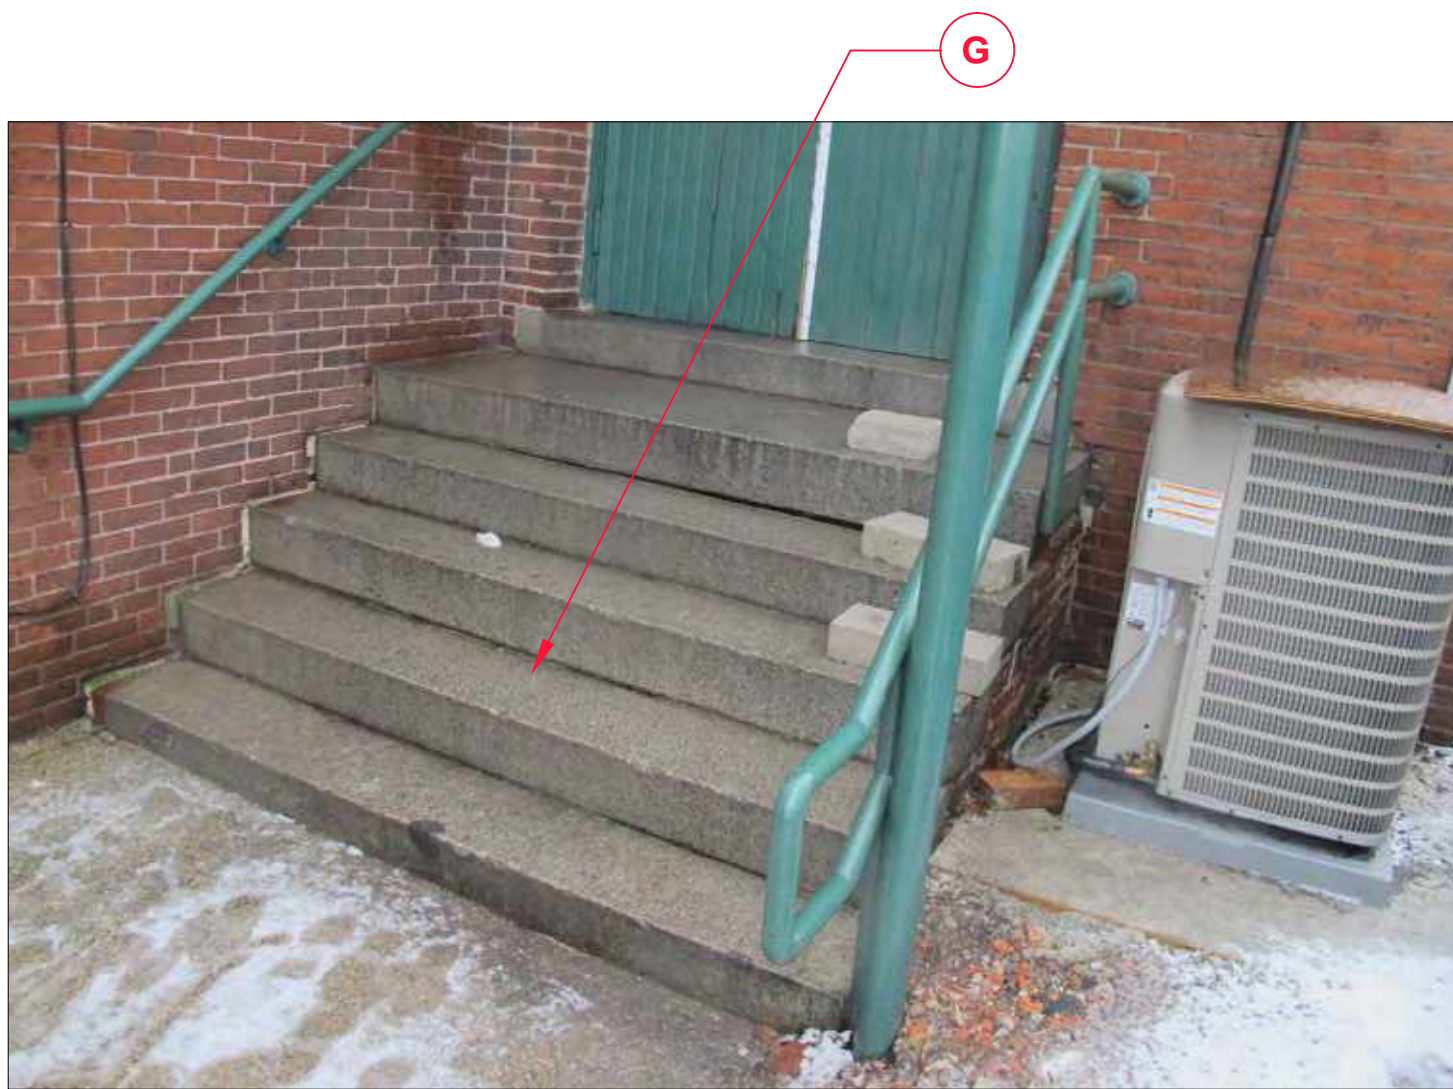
Existing granite stair to remain at Sanctuary entrance.
